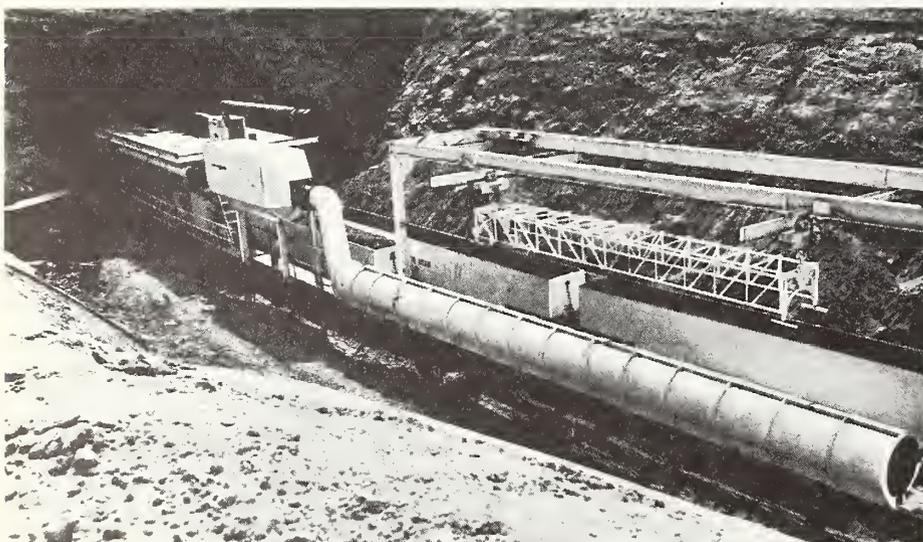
Air duct Telescope Connected to a Dust Collector, and Installed at the Side of a Loading Belt Frame
